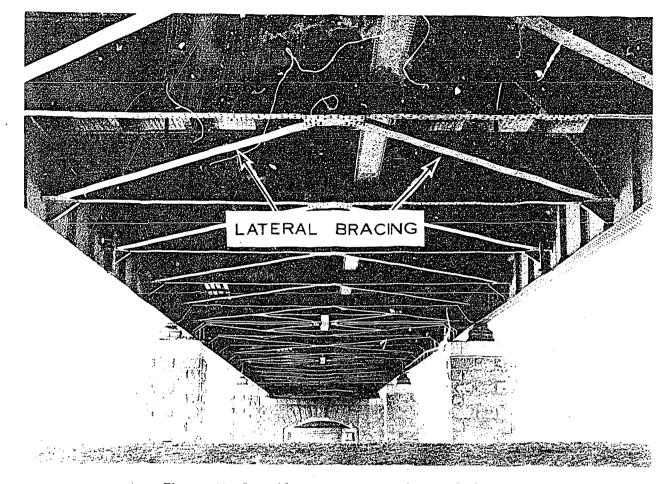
Lateral bracing system on steel two-girder bridge.
